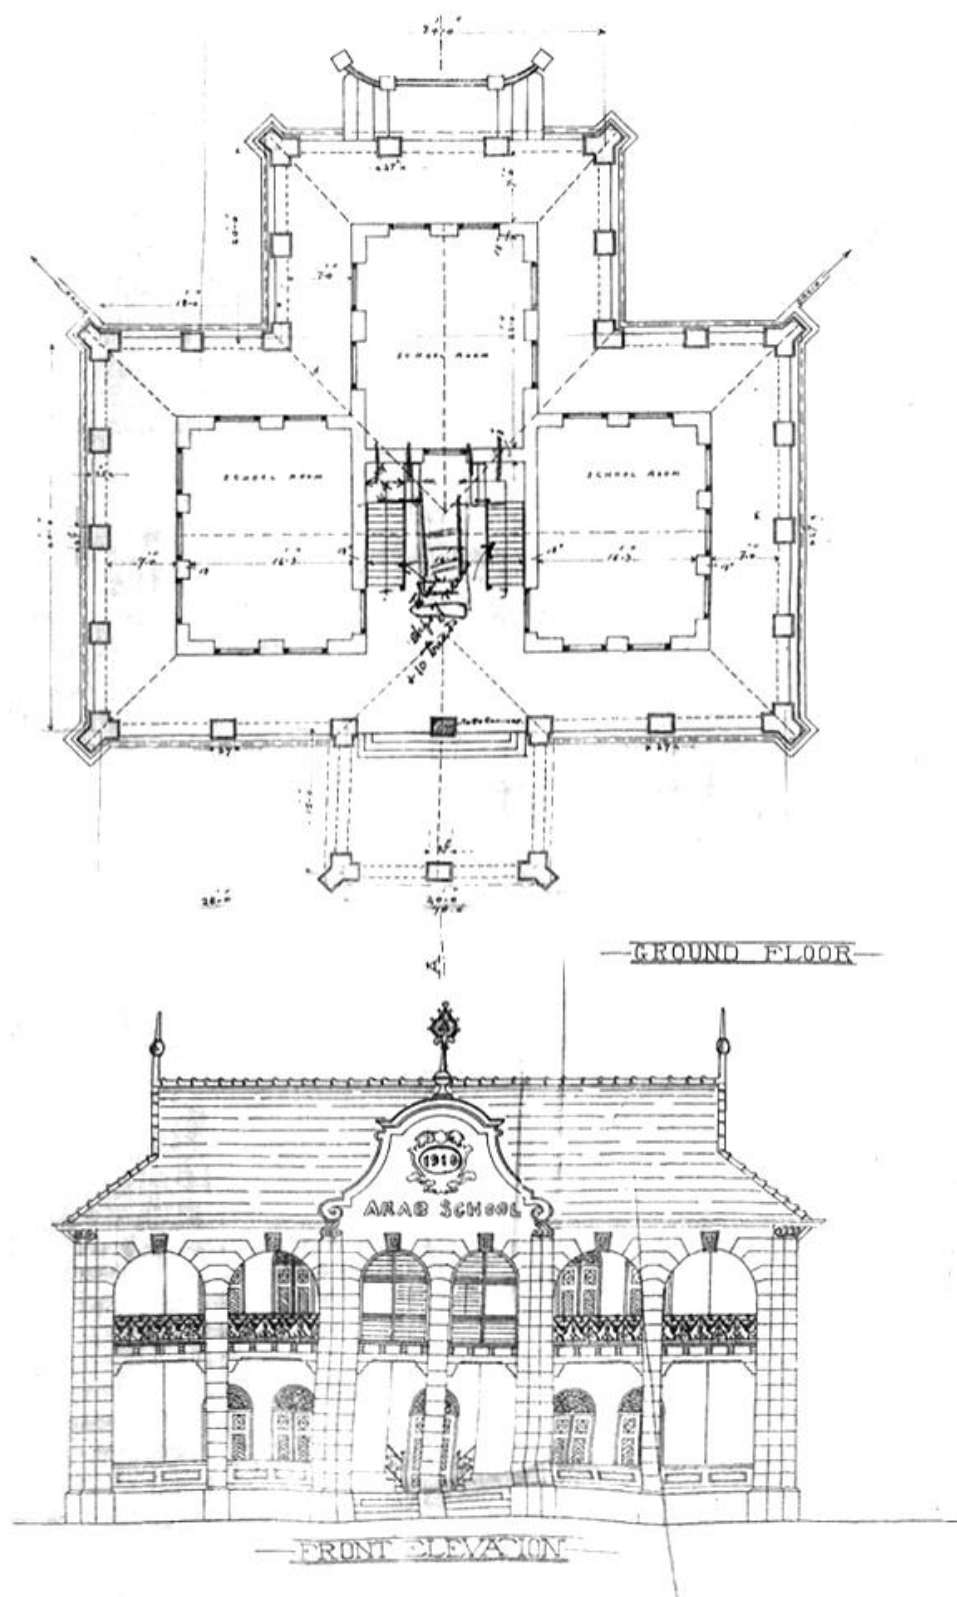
M.E. Alsagoff. Revised plan and elevation for the Malay Free School at Jalan Sultan, 1910. NAS CBS 127, Building Plan 10.375.
